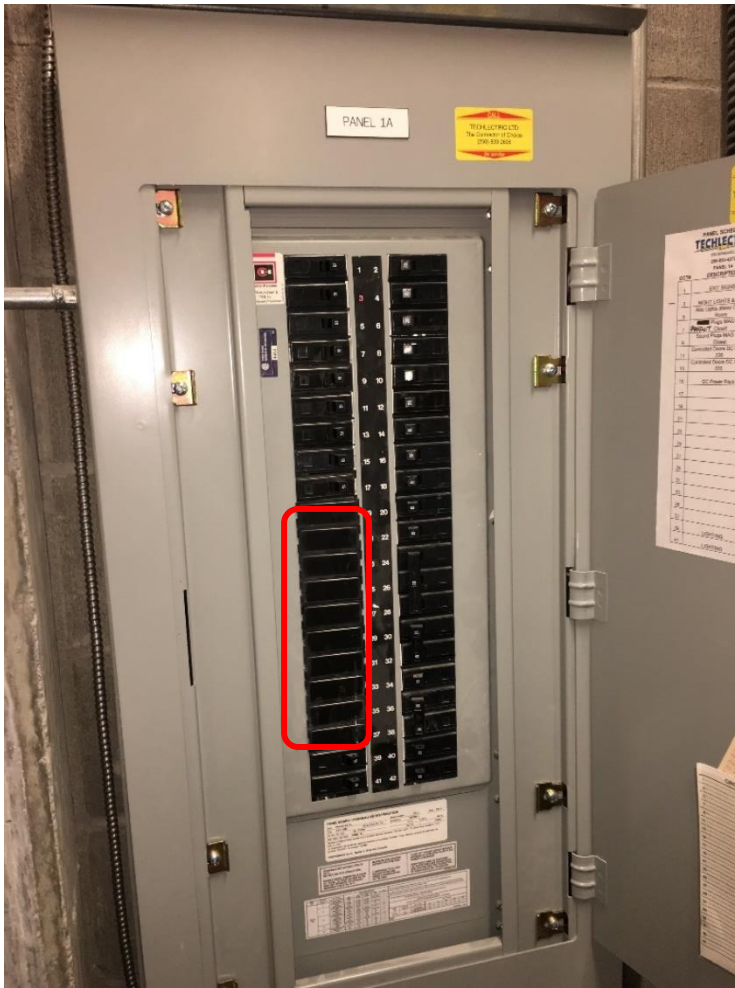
Sub-Panel 1A (Room 138) Spare Breaker Positions
